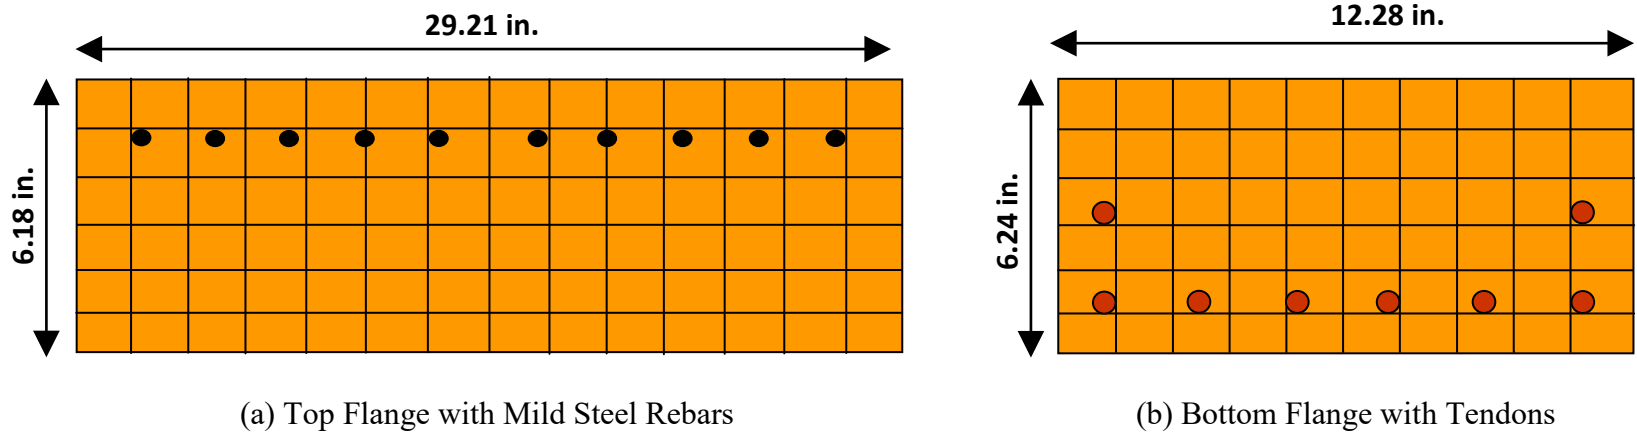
Section Discretization of NonlinearBeamColumn Elements for Girder Specimen F2
